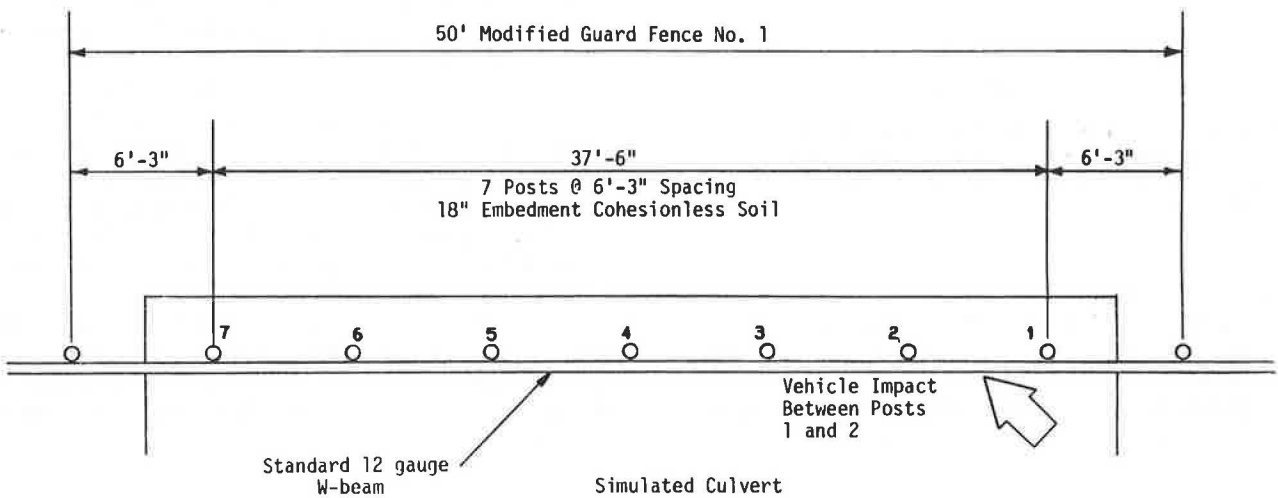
Plan view of modified guard fence No. 1 installation for Crash Test 1.
